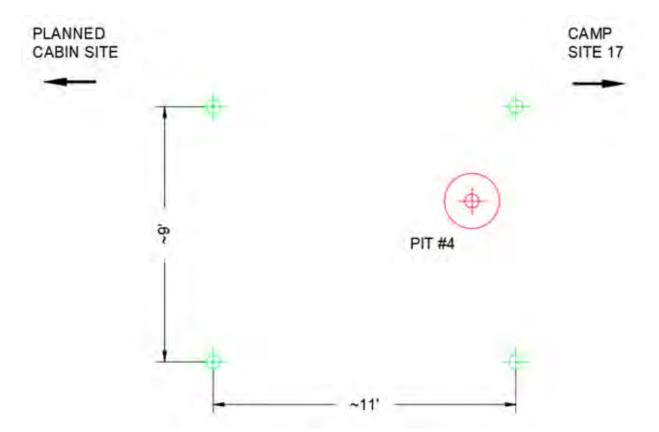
Soil test pit #4 within the planned footprint of the vault toilet building. Refer to site plan map earlier in document. Building corners (green points) have only roughly been laid out at this time.
